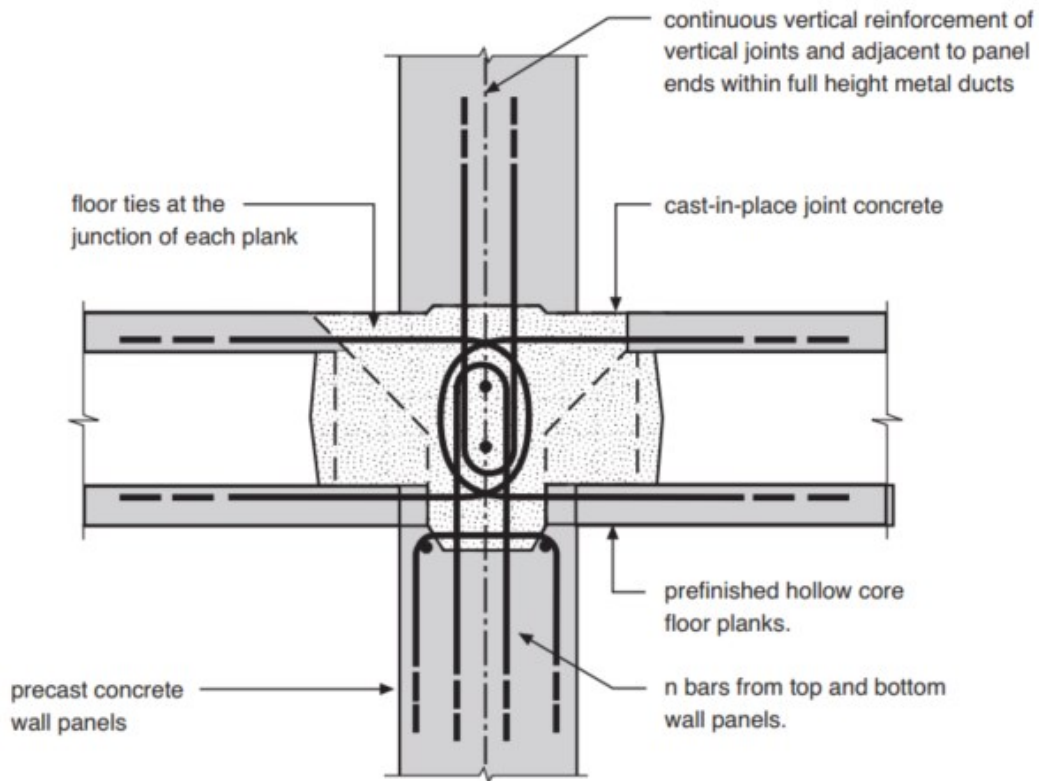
Nearly monolithic precast wall construction horizontal joint of the SCT system [25]
